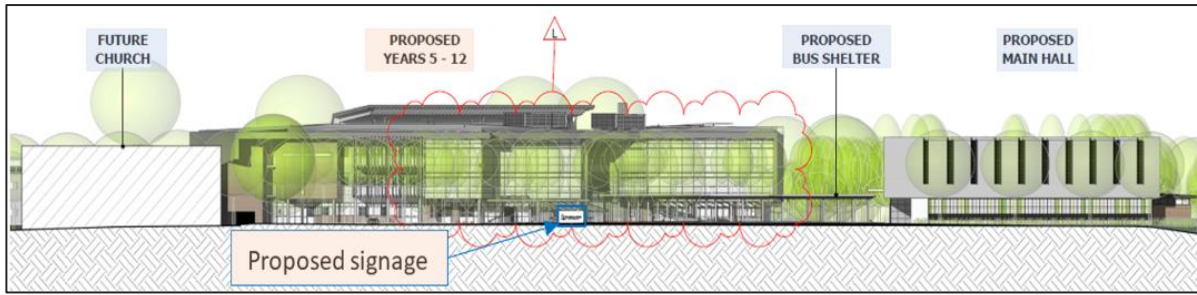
| Approved and proposed external façade (Source: Applicant’s SRtS 2022)
